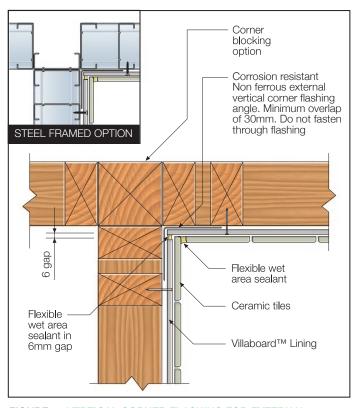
VERTICAL CORNER FLASHING FOR EXTERNAL MEMBRANE - SHOWER RECESS
